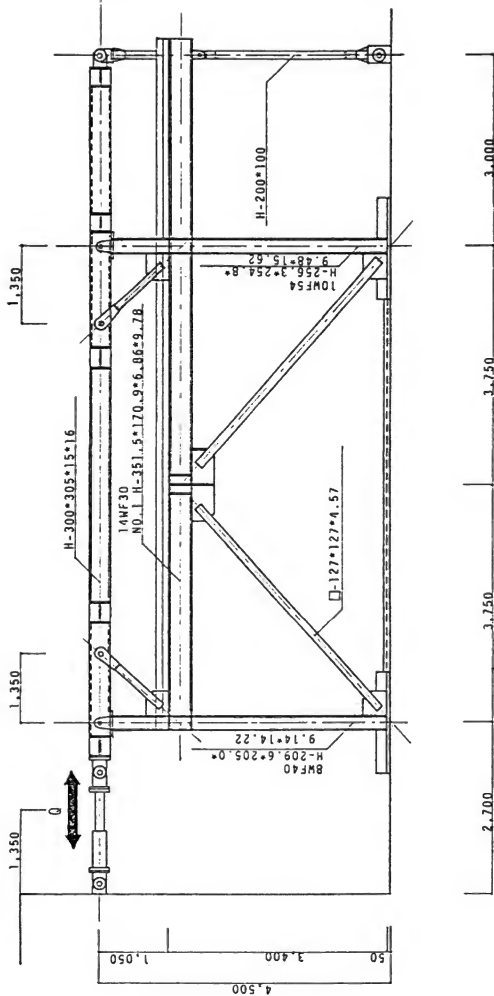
Test Specimen No.1 ,Static Test of Composite Beams
